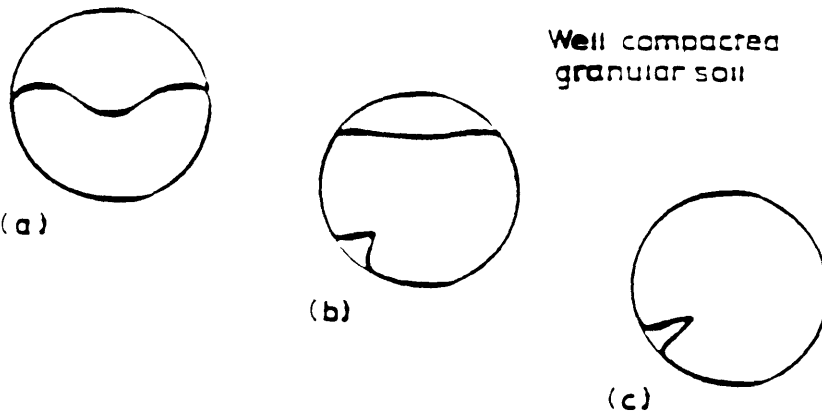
Collapse Modes of Thin-walled Buried Cylinders.
